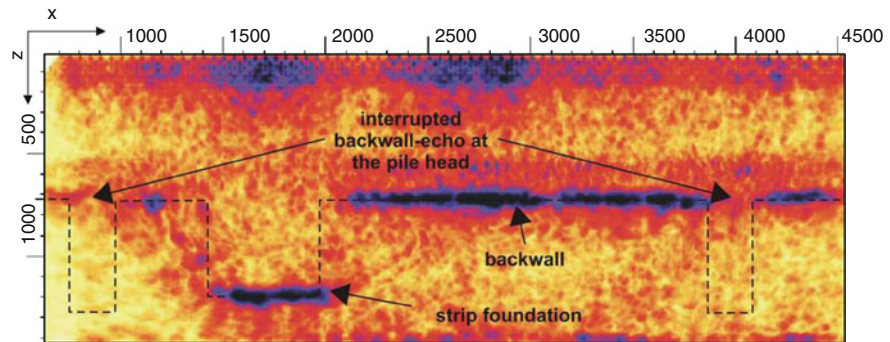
Cross section d-d revealing the slab geometry and location of the pile heads
